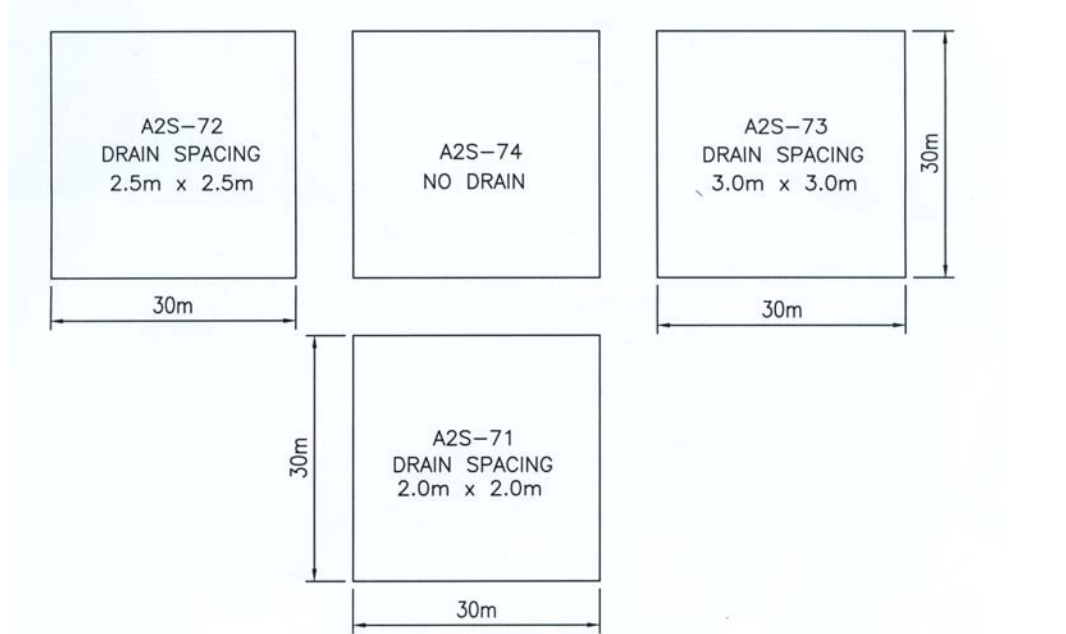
Layout plan and vertical drain spacing of sub-areas at the Pilot Test Site (Arulrajah et al., 2003a).
